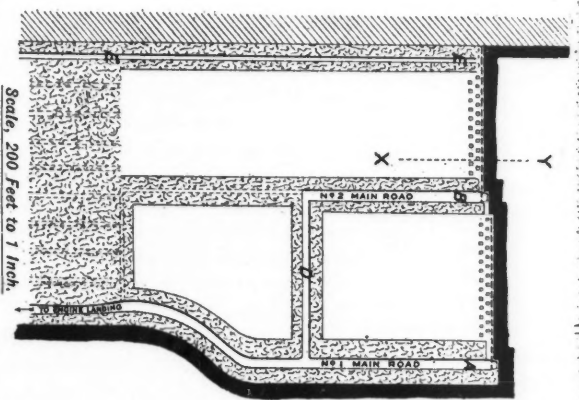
PLAN OF THE NEW METHOD OF LONGWALL-WORKING WITH THE MICKLEY CONVEYOR.
